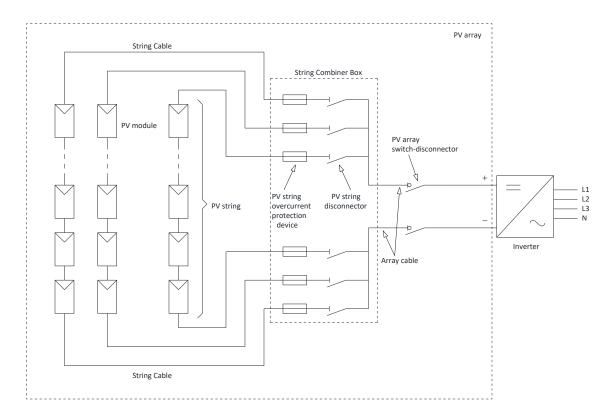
Example of string collection into a string-combiner box for definition of overcurrent protections
